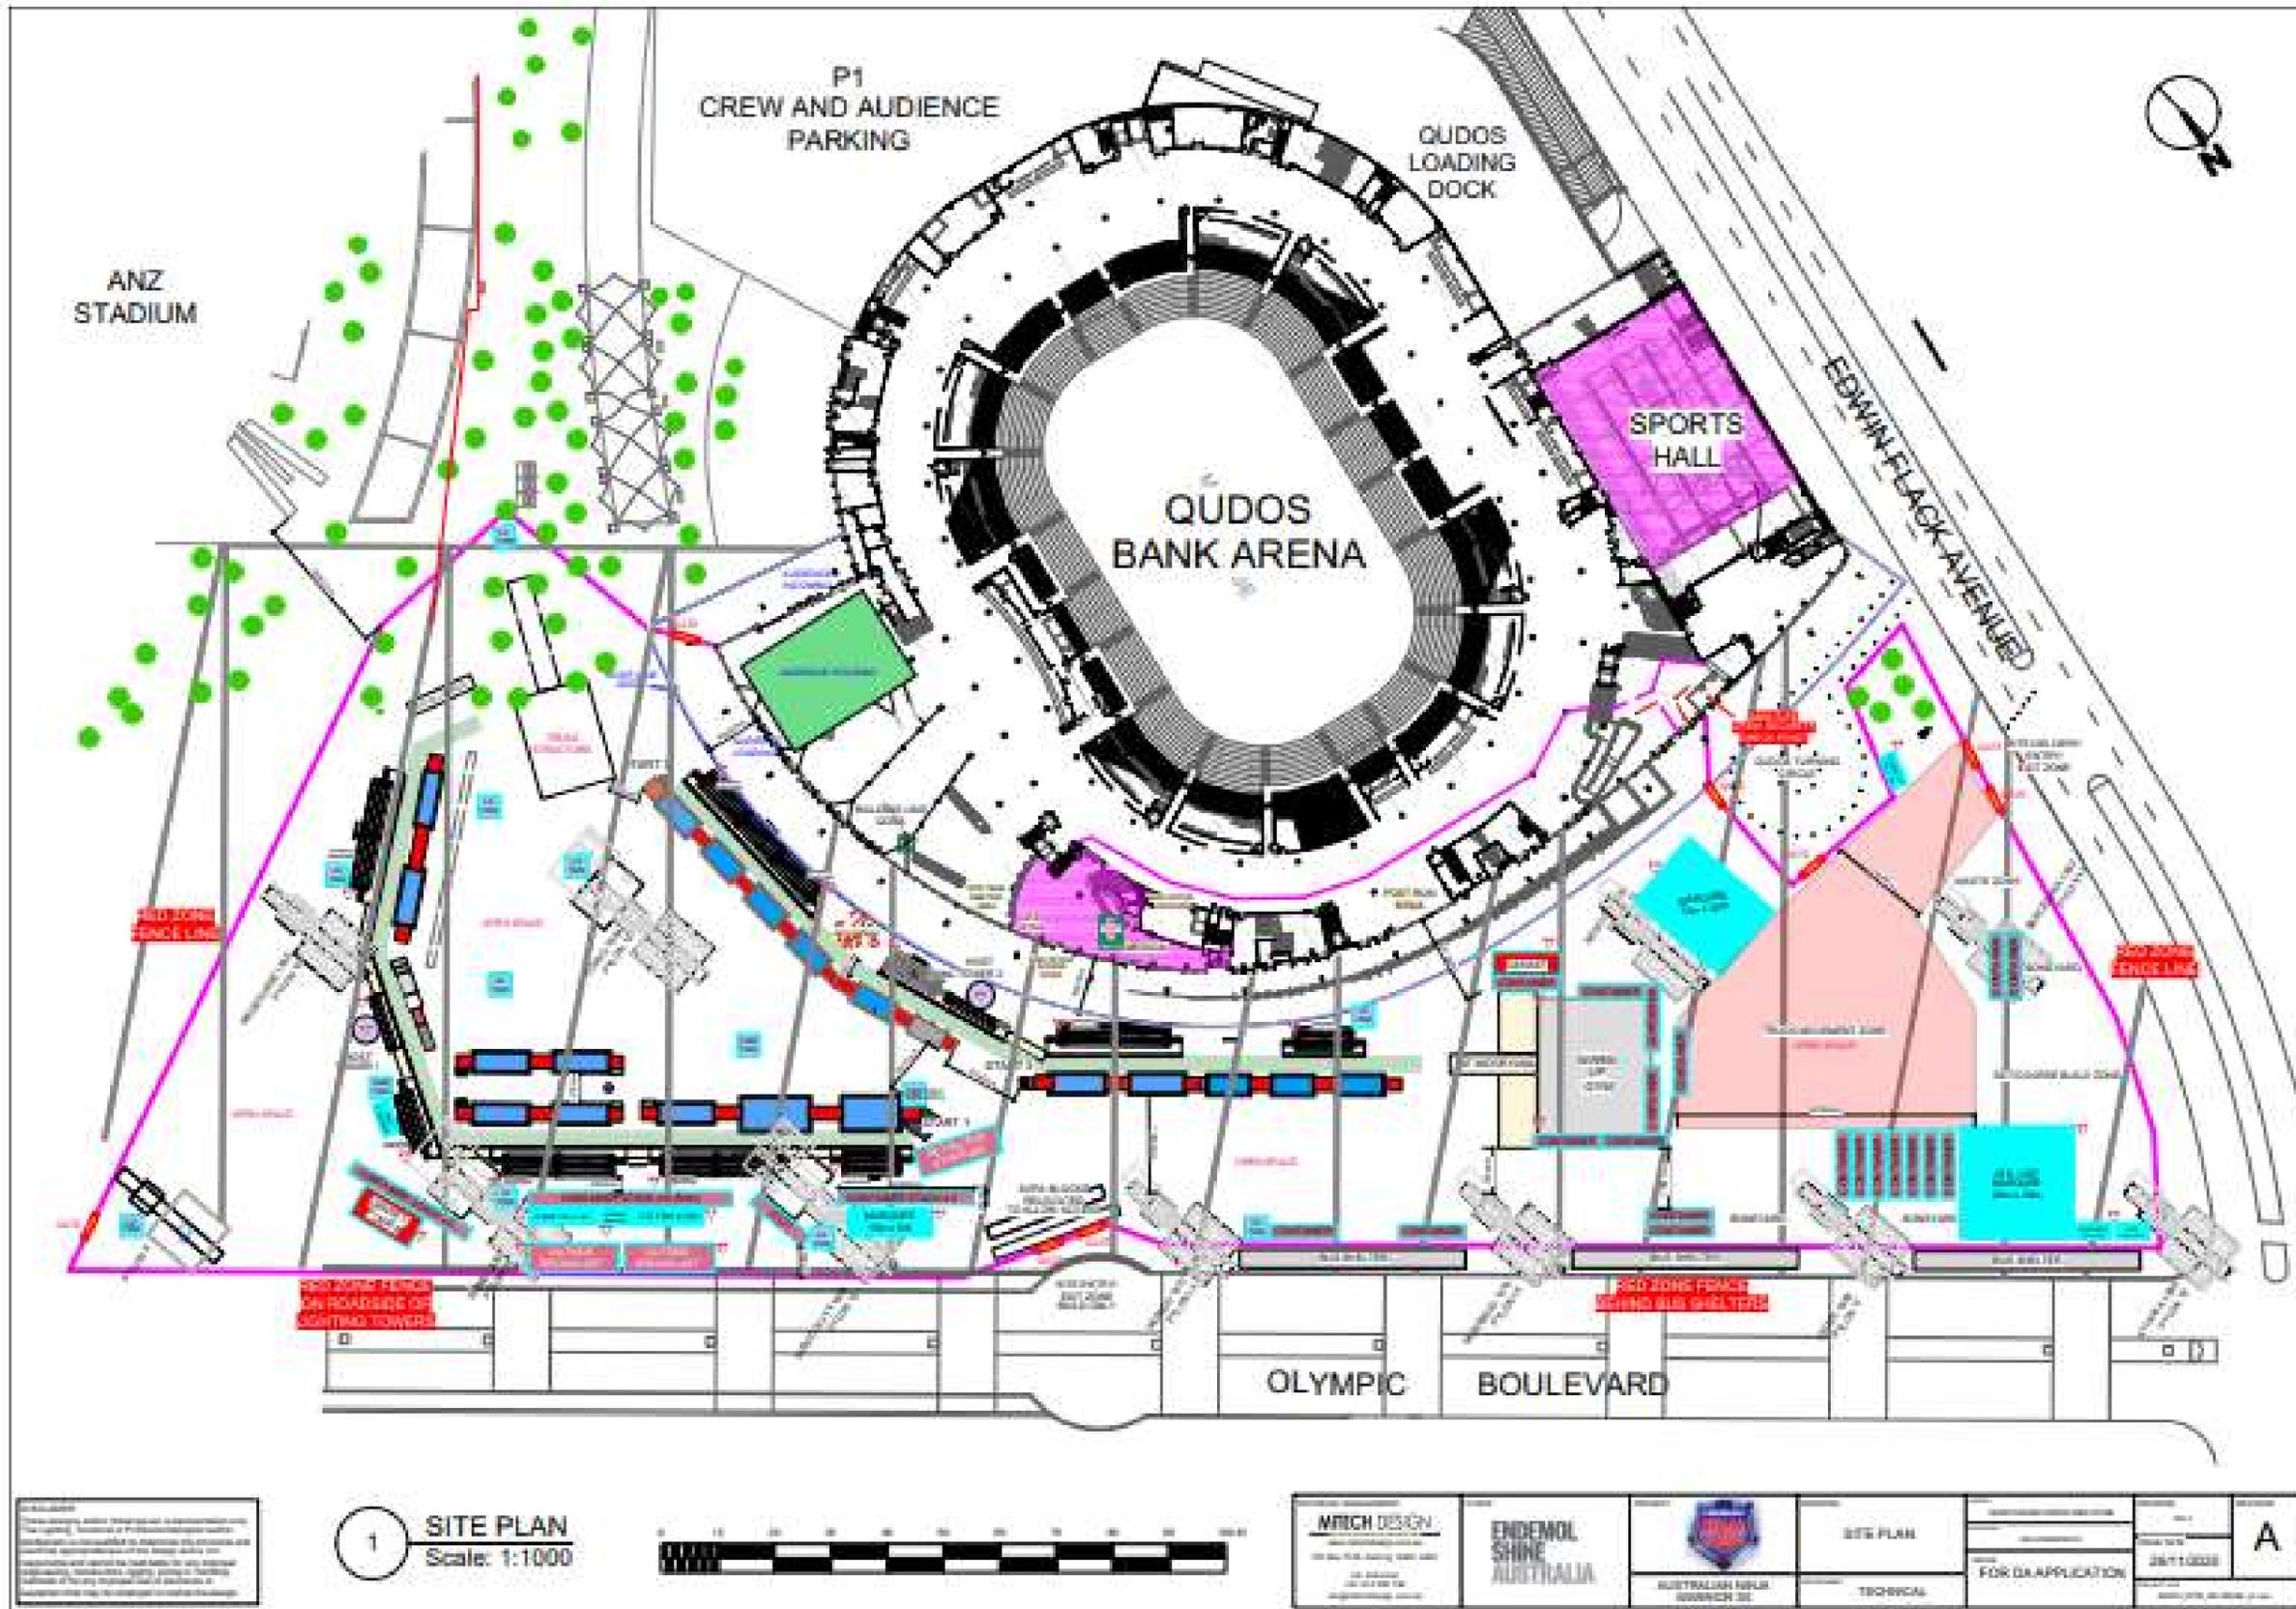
[NOT TO SCALE] site plan of proposed filming event
